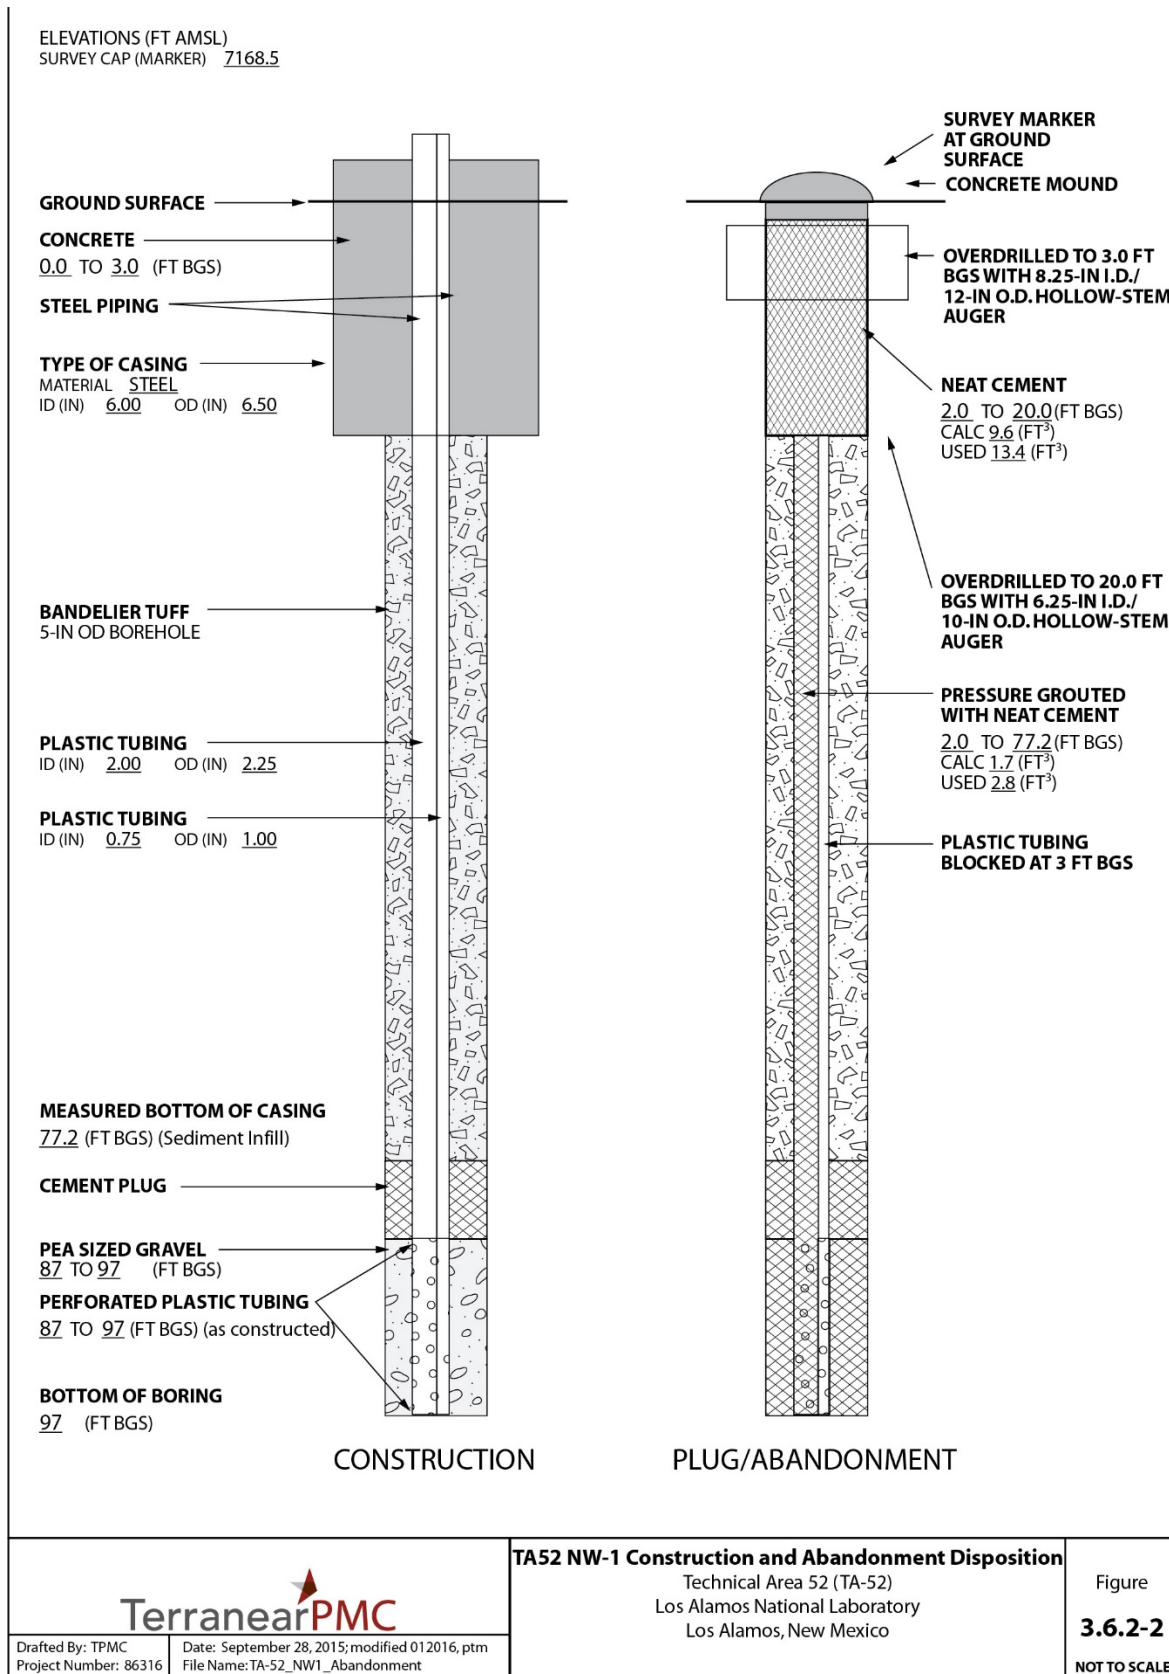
TA-52 Well NW-1 construction and abandonment disposition
